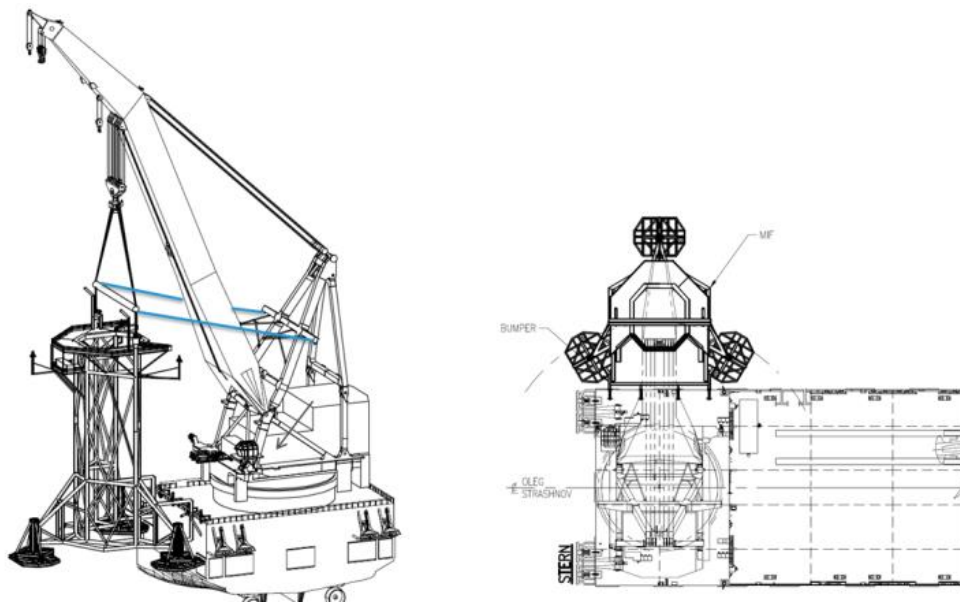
Lifting of Monopile Installation Frame [20]
